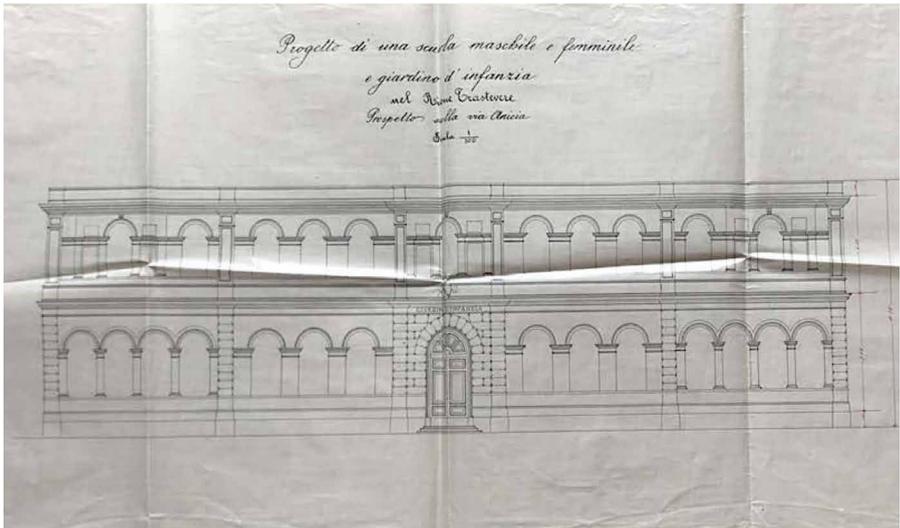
Elevations of the building project, 186-888 (Archivio Storico Capitolino, Rip VI).
